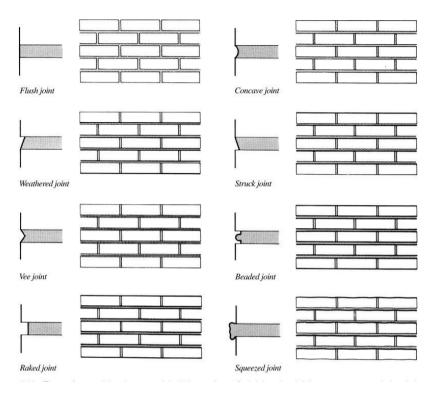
Types of mortar joint. A concave joint is better than a flush joint when bricks are uneven; struck, beaded or raked joints should not be used in exposed conditions because water will lie on the exposed edge of the bricks. The squeezed joint will also allow water to penetrate brickwork. Ordinary mortar joints can be raked back and repointed in coloured mortar to any of these profiles; coloured joints may have a dramatic effect on the overall appearance of the brickwork.
